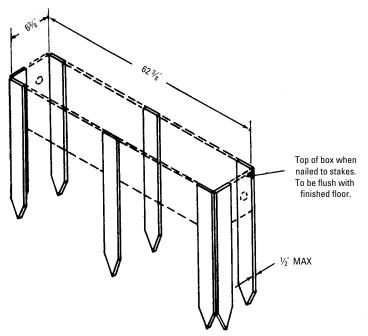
Stake arrangement for masonry floor opening. (*Courtesy Weil-McLain Co.*)
